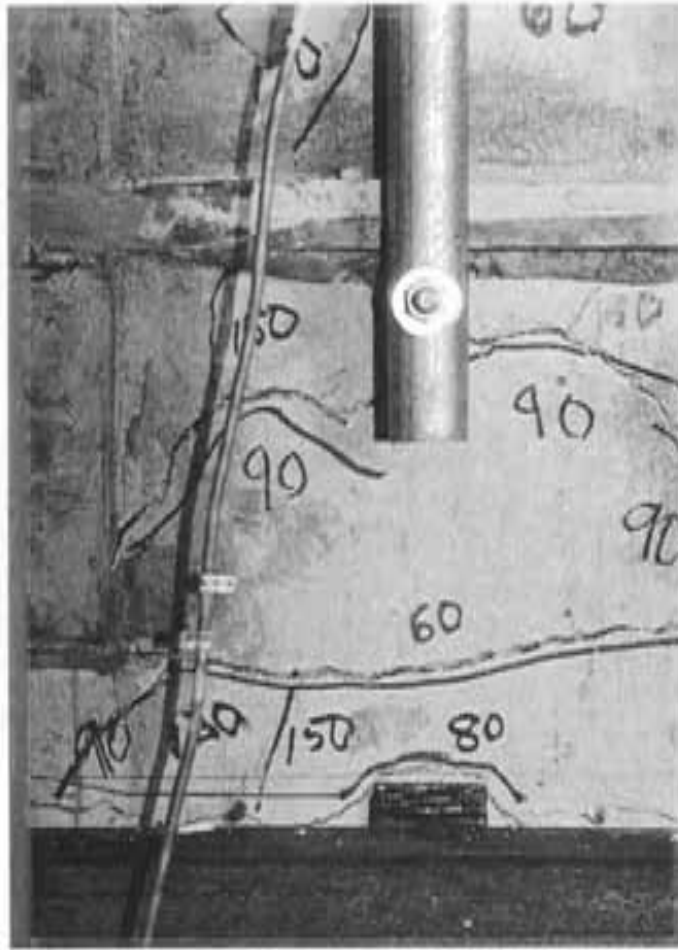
Large cracks outside the splice region demonstrating yielding of column reinforcing bars
